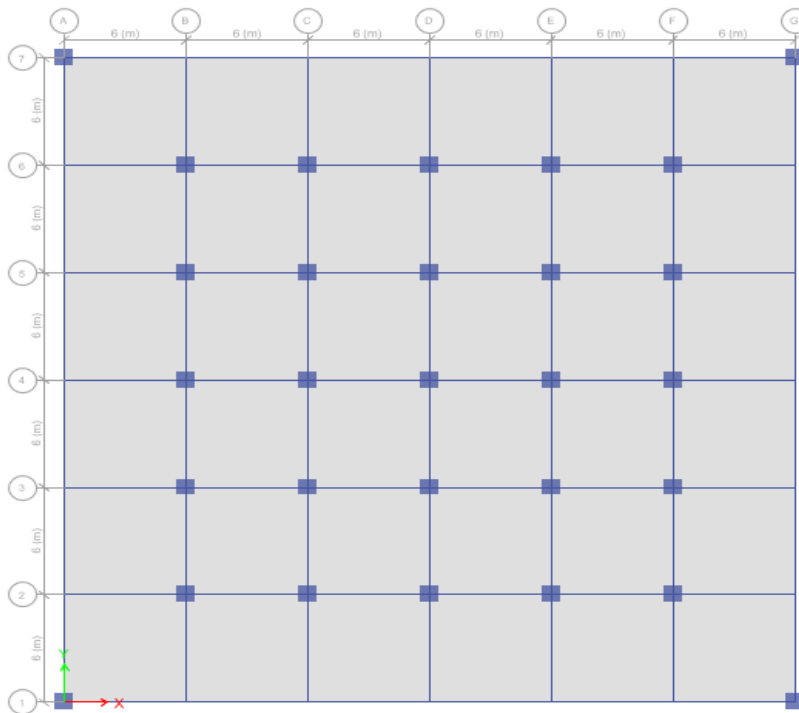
Floor plan of Diagrid, pentagrid and hexagrid structural system building
